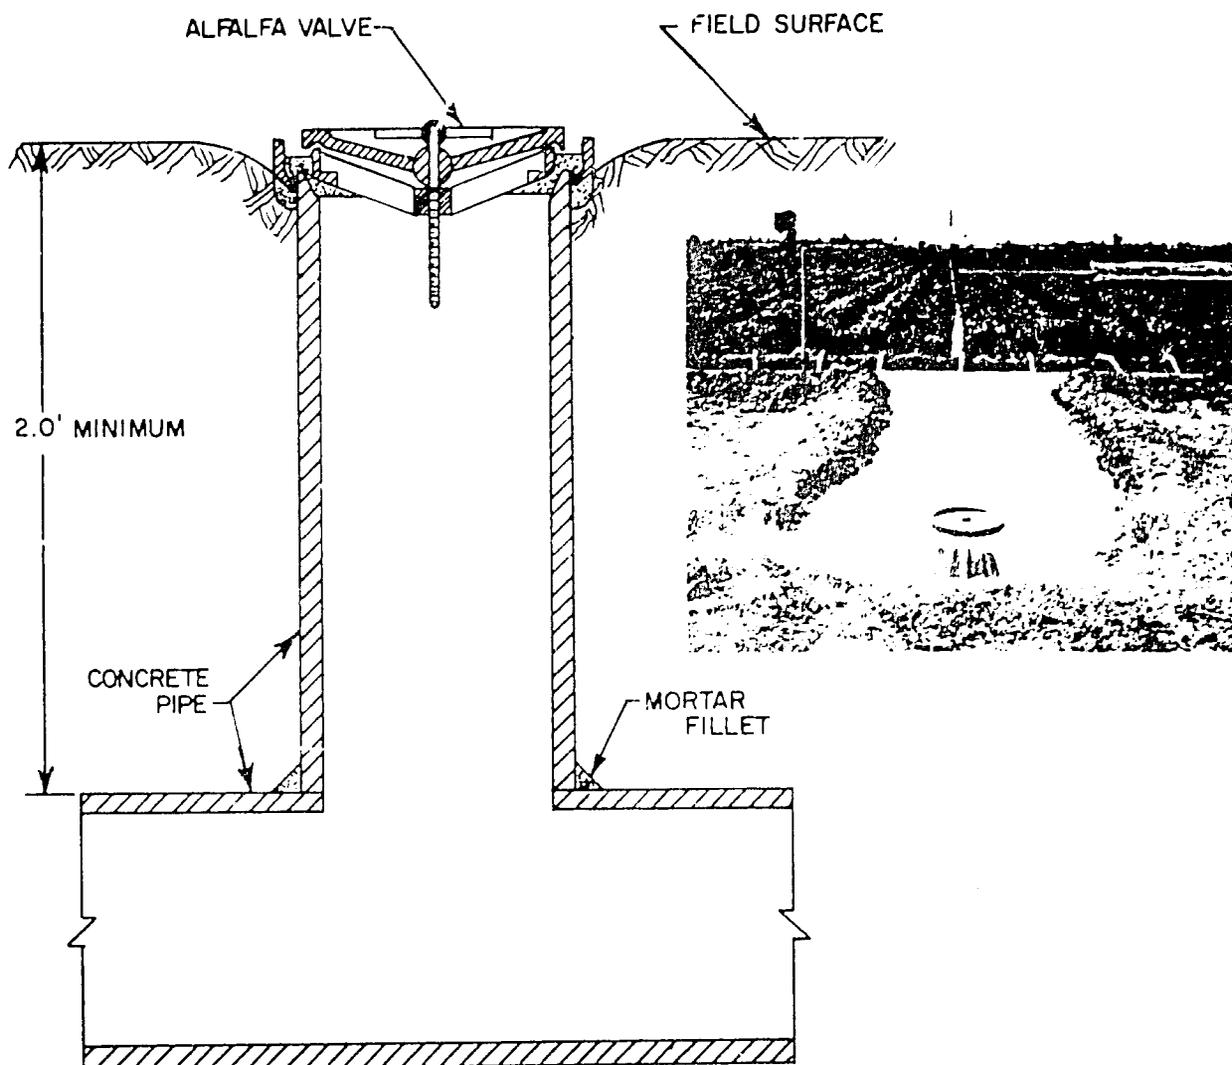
Typical alfalfa valve hydrant; the riser and valve assembly are sometimes cast to a short section of main pipeline to simplify installation (4, 32).
